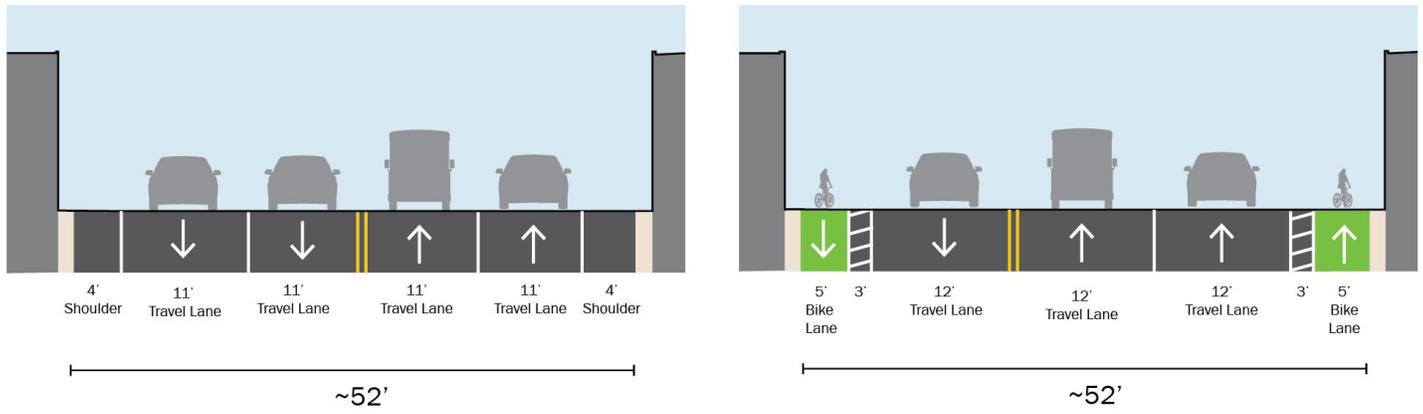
Existing and Recommended Cross Section of Raymond Boulevard (looking west)
